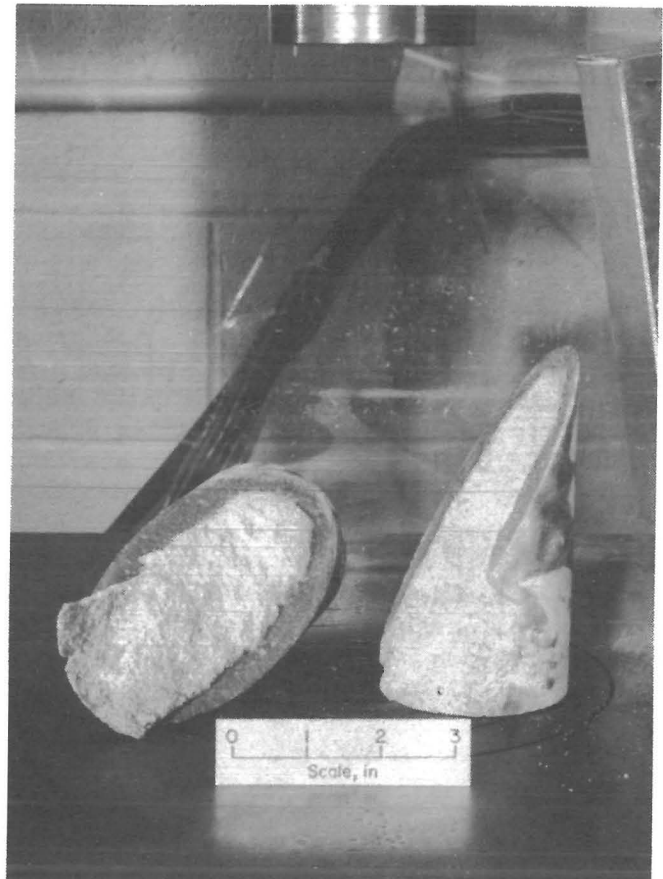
Failure surface appearance when binder material approaches or exceeds strength of concrete.
